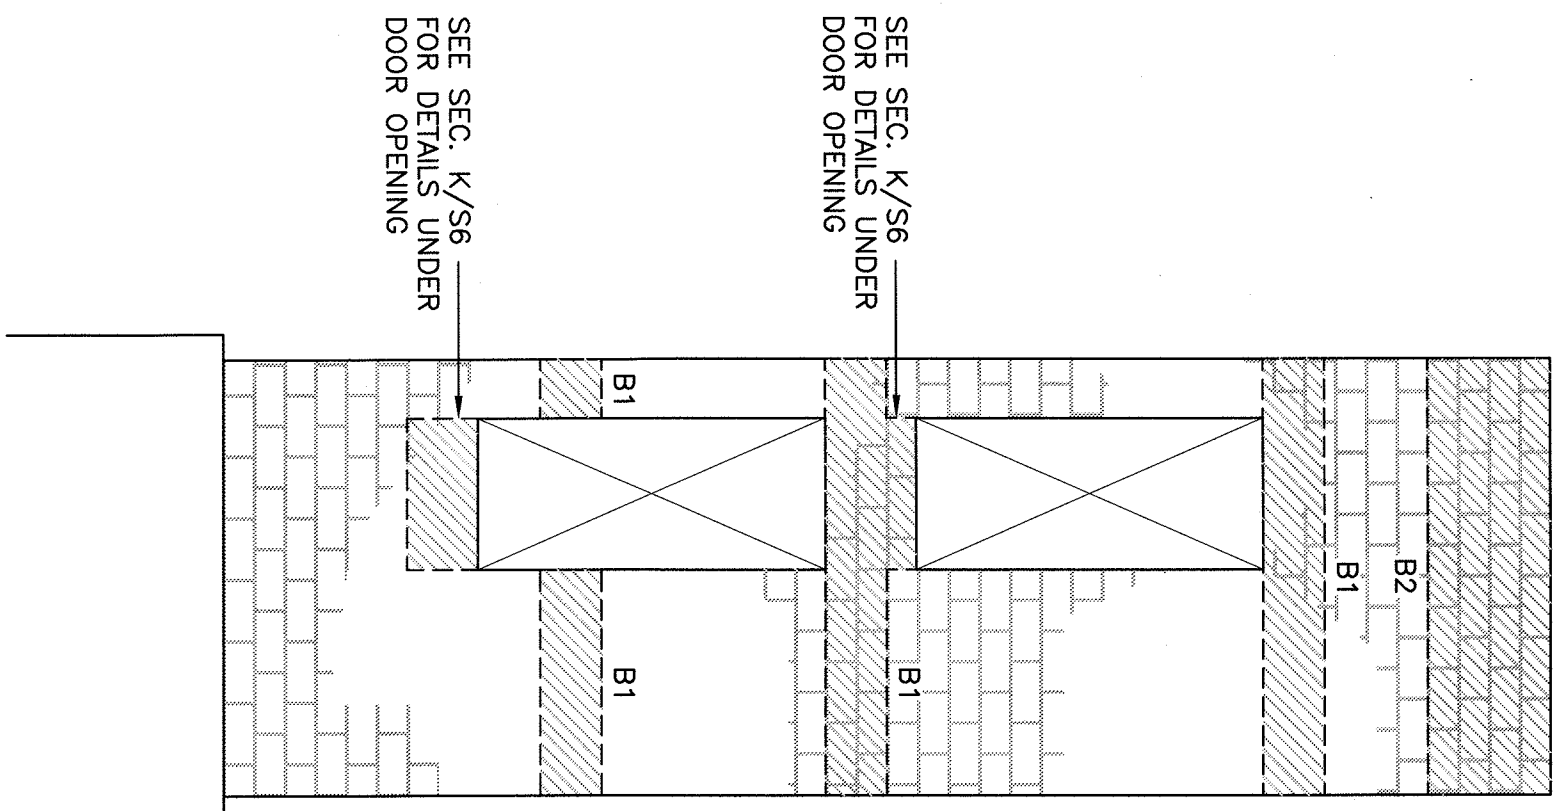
DETAIL - TYPICAL ELEVATOR SHAFT PLAN S8
